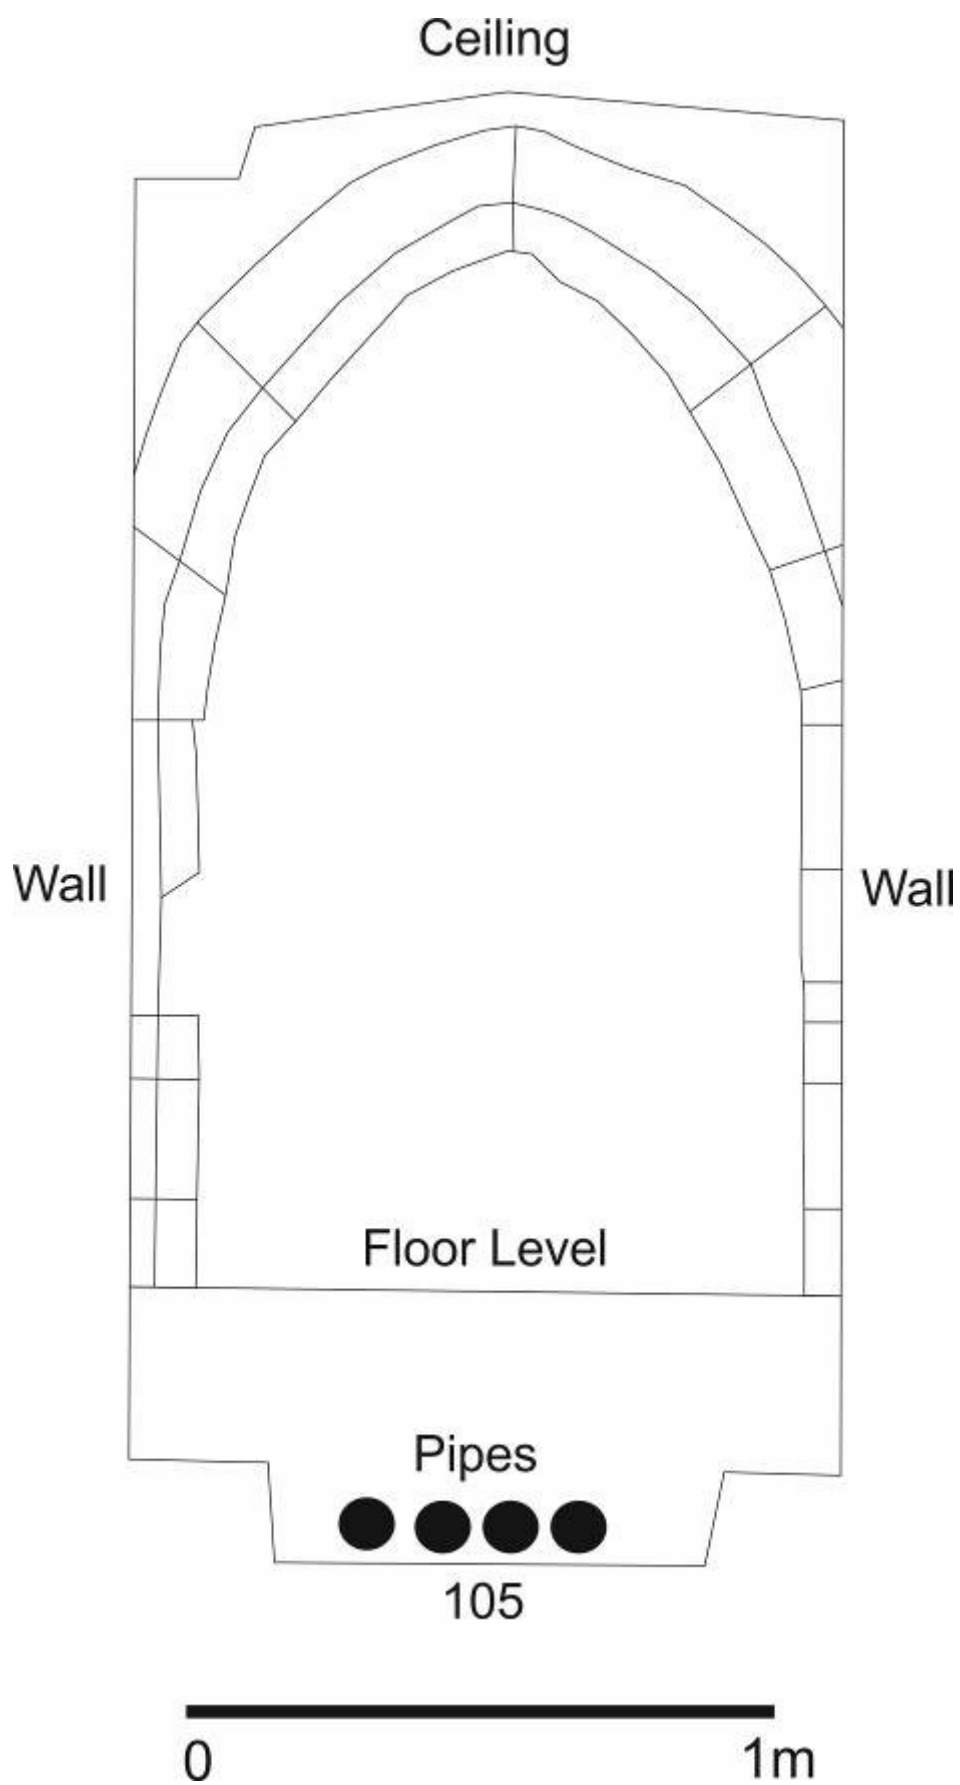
Arched doorway into Chapel looking South Scale 1:10
